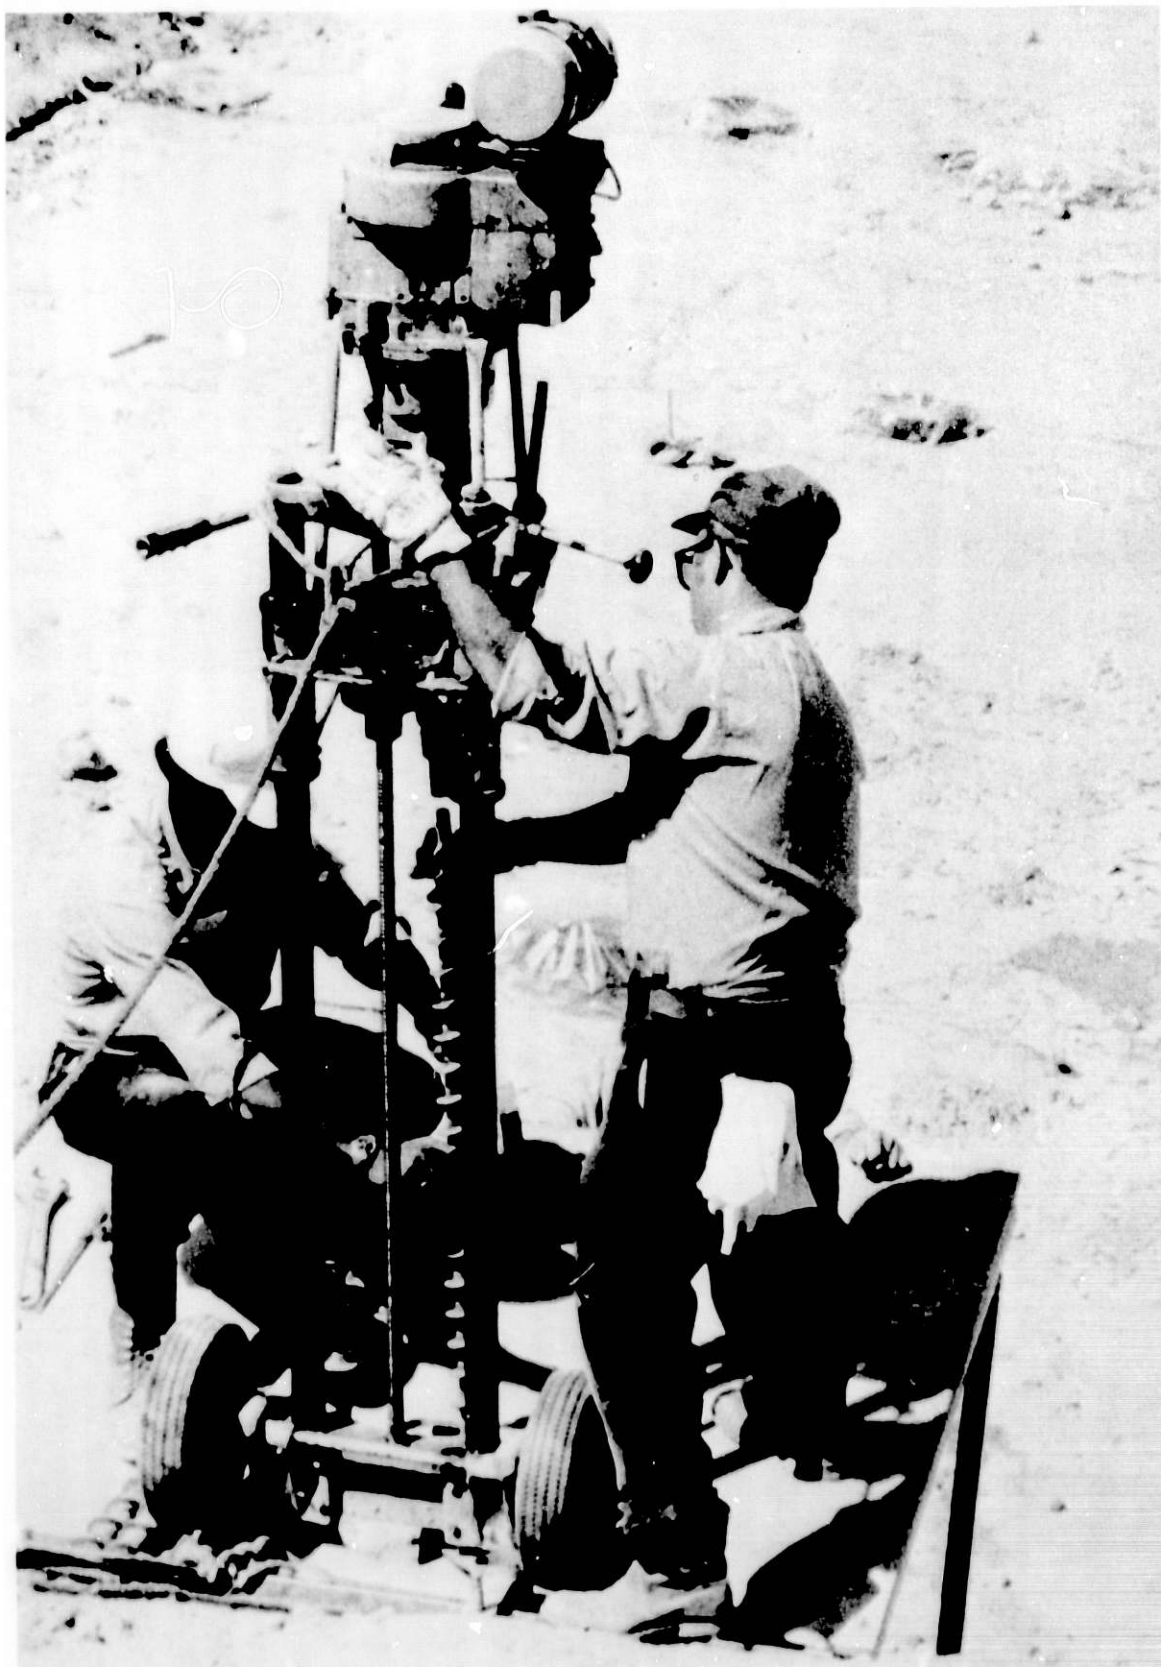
Drilling on the Bottom of the Pond for Underground Thermocouples
